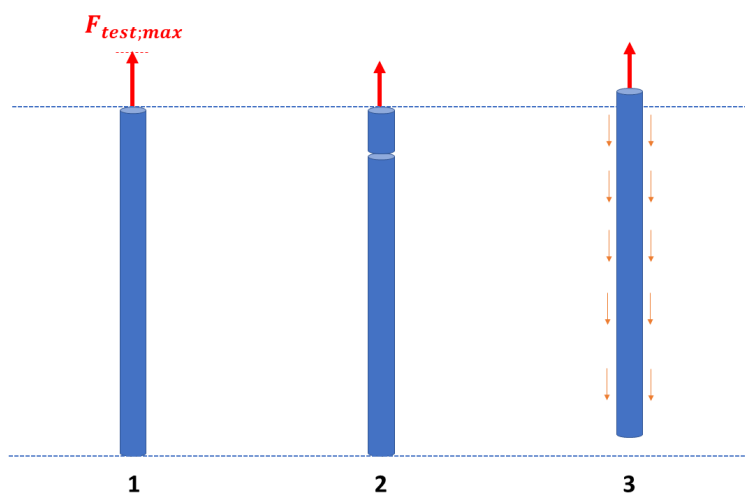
Boundaries of load test on tension piles: maximum test load (1), structural failure (2) and geotechnical failure (3).
